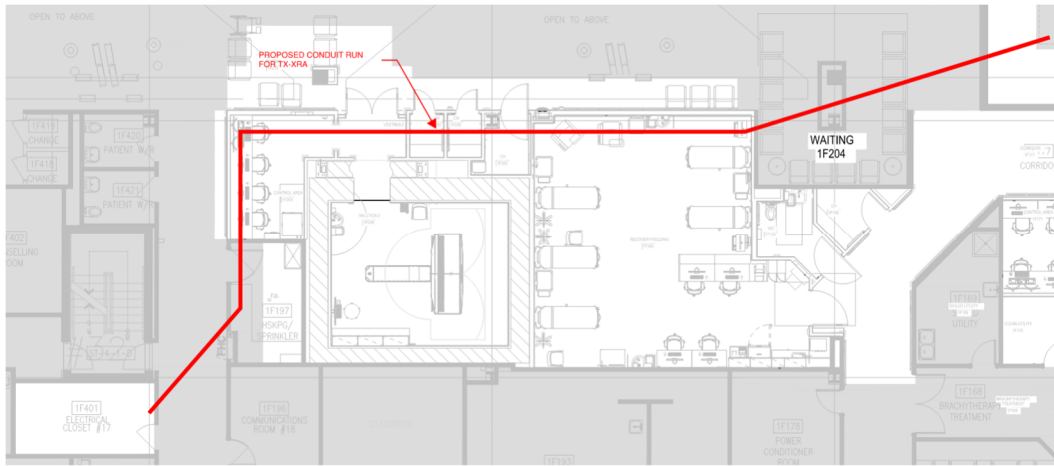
Proposed conduit runs from Main Electrical Room 1F113 to Electrical Closet #17 1F401
